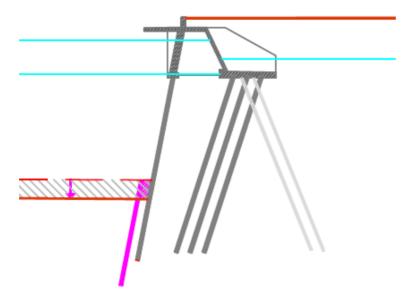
principle cross section of the additional wall with concrete connection (Schutte, Inventory and preselection, 2017)
